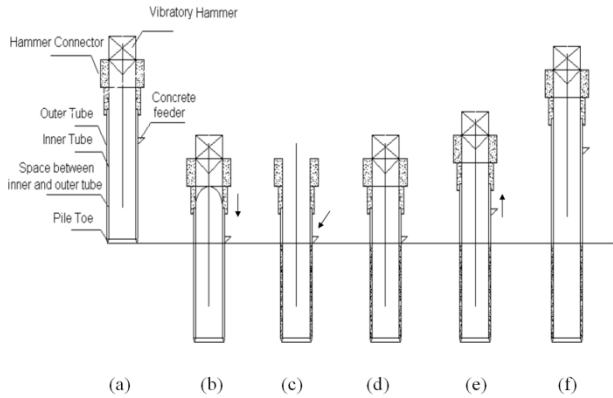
CTP/PCC pile installation sequences: (a) positioning casing; (b) driving casing; (c) placing steel gage and pouring concrete; (d) vibrating casing; (e) extracting casing; (f) completing of the pile
